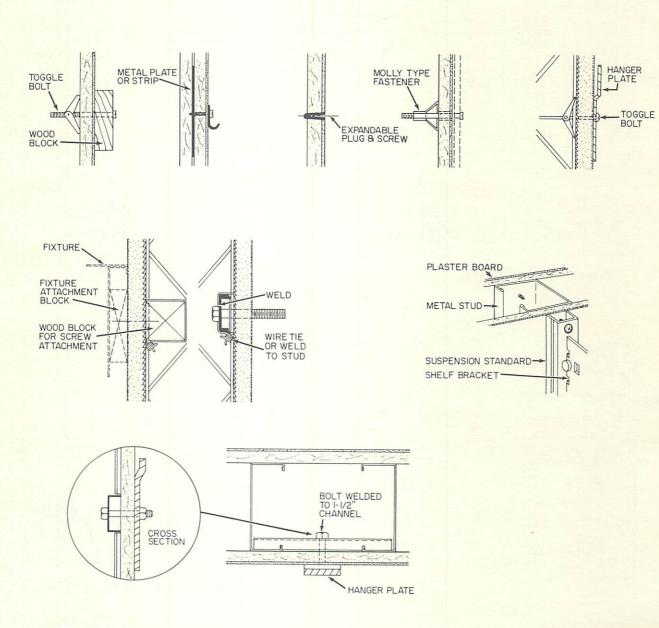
Anchor and Hanger Installation — Commercial Construction
